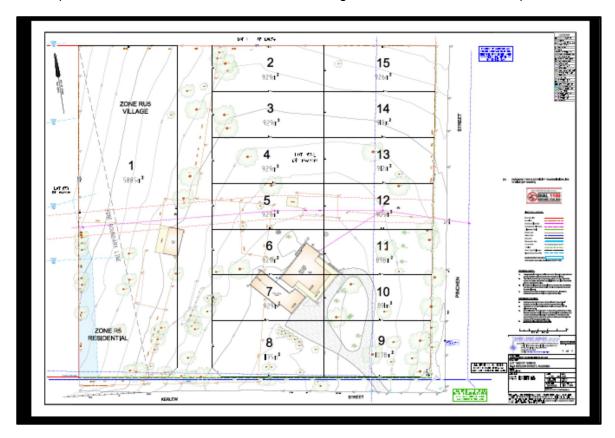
Site plan showing the flood affected area of 8 Kerlew Street.
